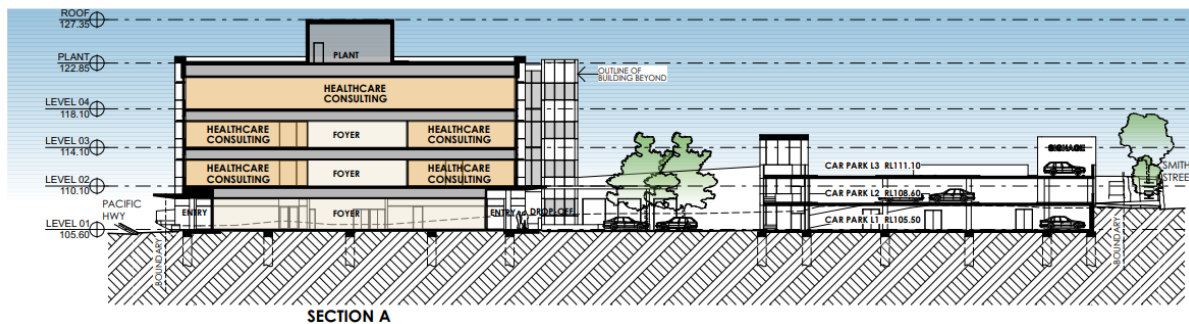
Section plans of the Project Area, showing location on pilings. (Source: Arcadia Landscape Architecture via Proponent).
